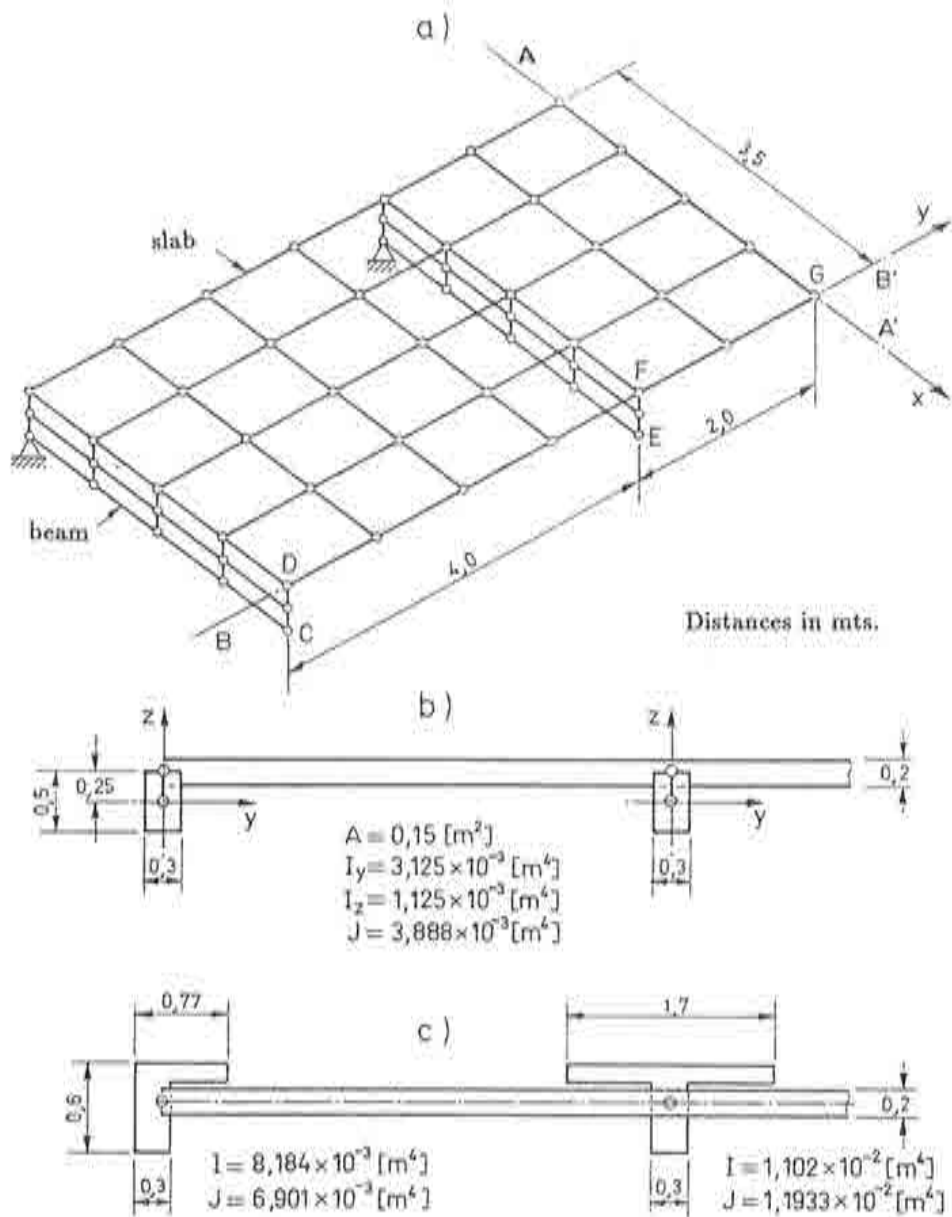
Slab-beam bridge under uniformly distributed loading. (a) Discretization of slab and beams in flat shell elements (b) Discretization in flat elements (slab) and 2 node 3D Timoshenko beams, (c) Discretization in plate elements (slab) and 2 node 1D Timoshenko beams. 1/4 of the structure analyzed for symmetry.
